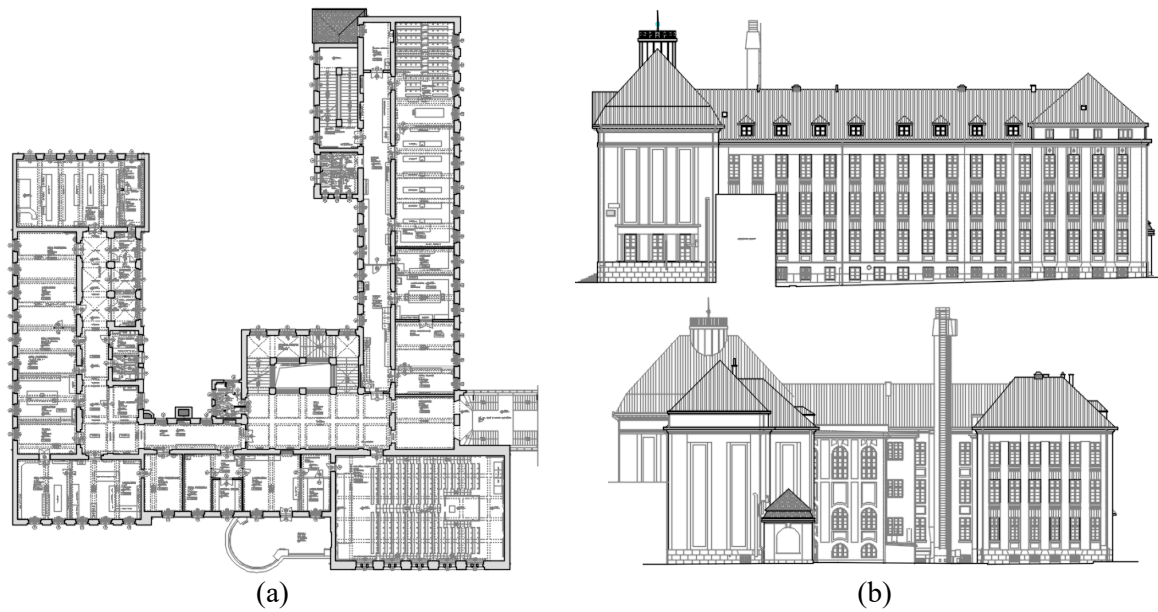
Documentation of the current condition of the School of Medicine, University of Zagreb building: (a) ground floor plan, (b) west and north façades of the building
